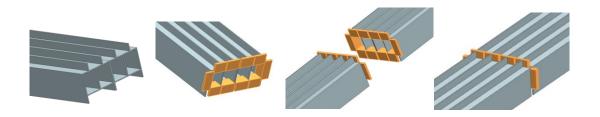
Bottom Beam's Longitudinal Connection - Connecting Brackets
